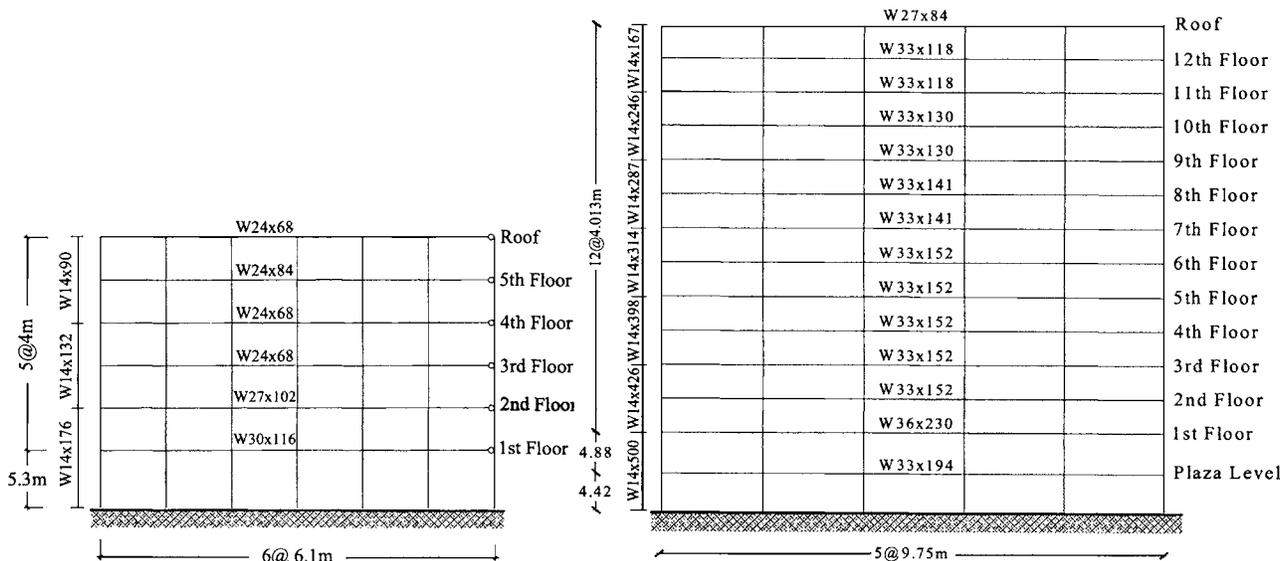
Elevation views of typical perimeter frames from 6- and 13-story steel buildings
